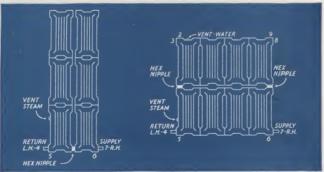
Assembled in two or more stacks. Fig. 6. Assembled in two or more One and two pipe steam only. Bottom feed. tiers. Water or steam.
